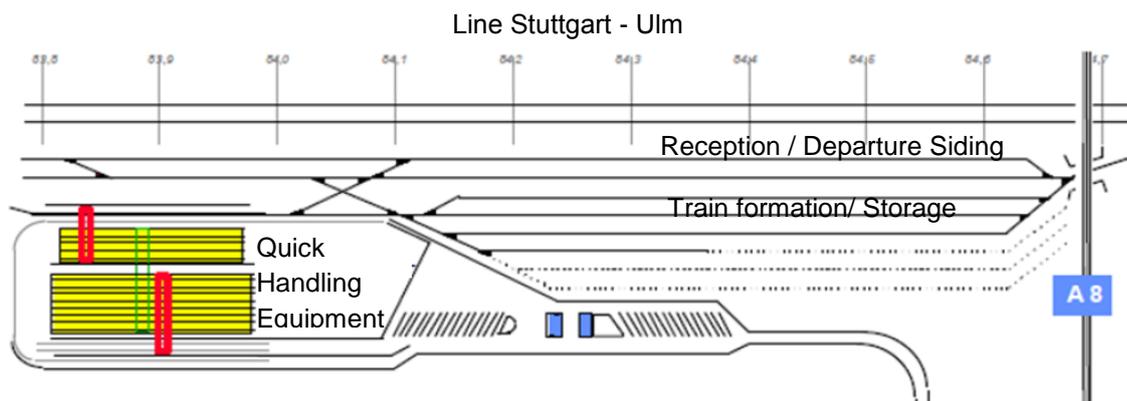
Layout of Krupp Fast Handling System (Impulse 2000)
